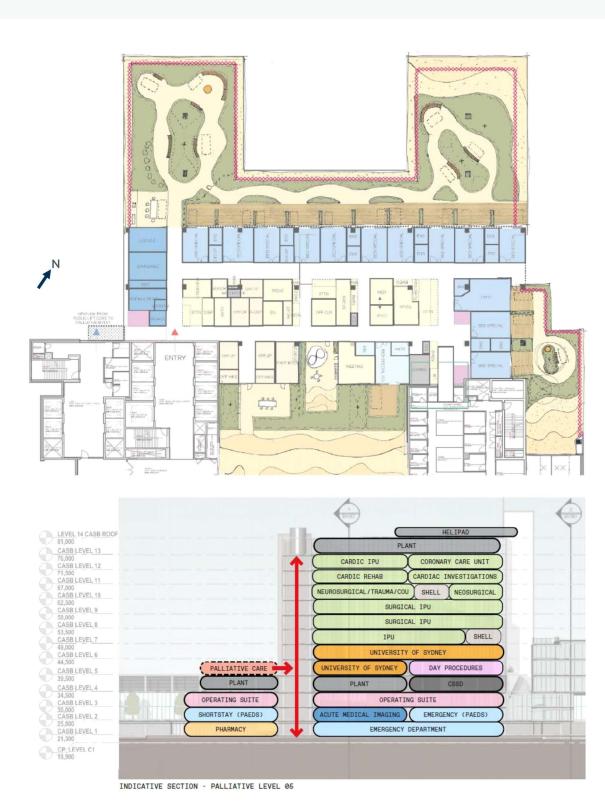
Site plan (top) and south-west Section (bottom) of proposed development
